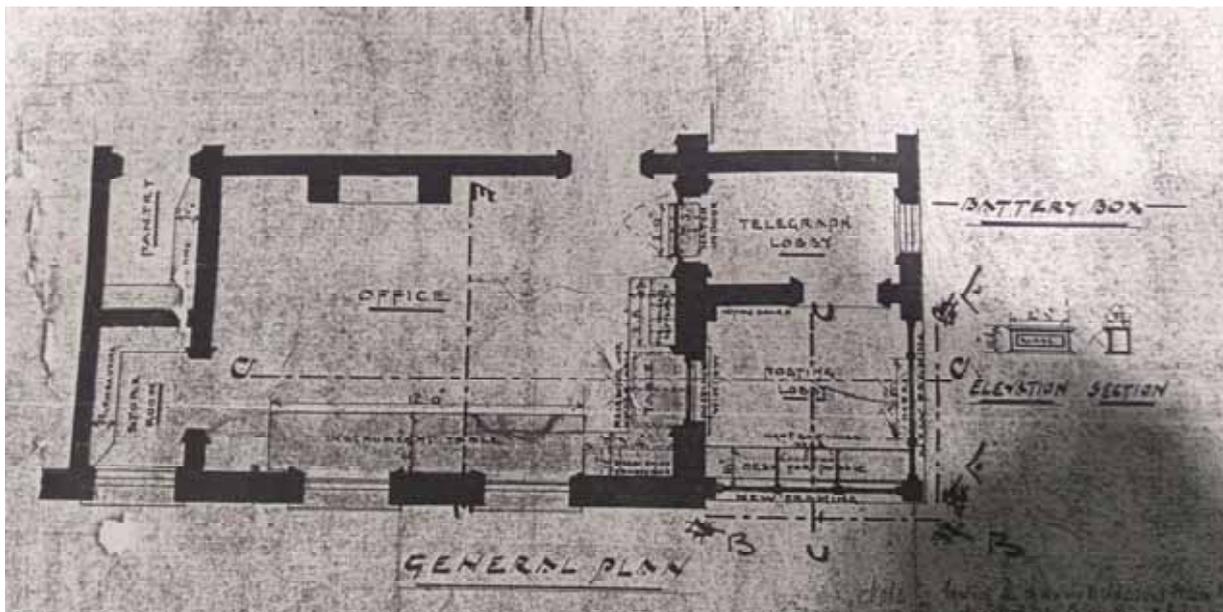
Floorplan dating to 1885 that showed that the original extent of the post office building, which excluded the verandah and the two projecting bays to the main elevations (built 1900) (Saleta 2016).
